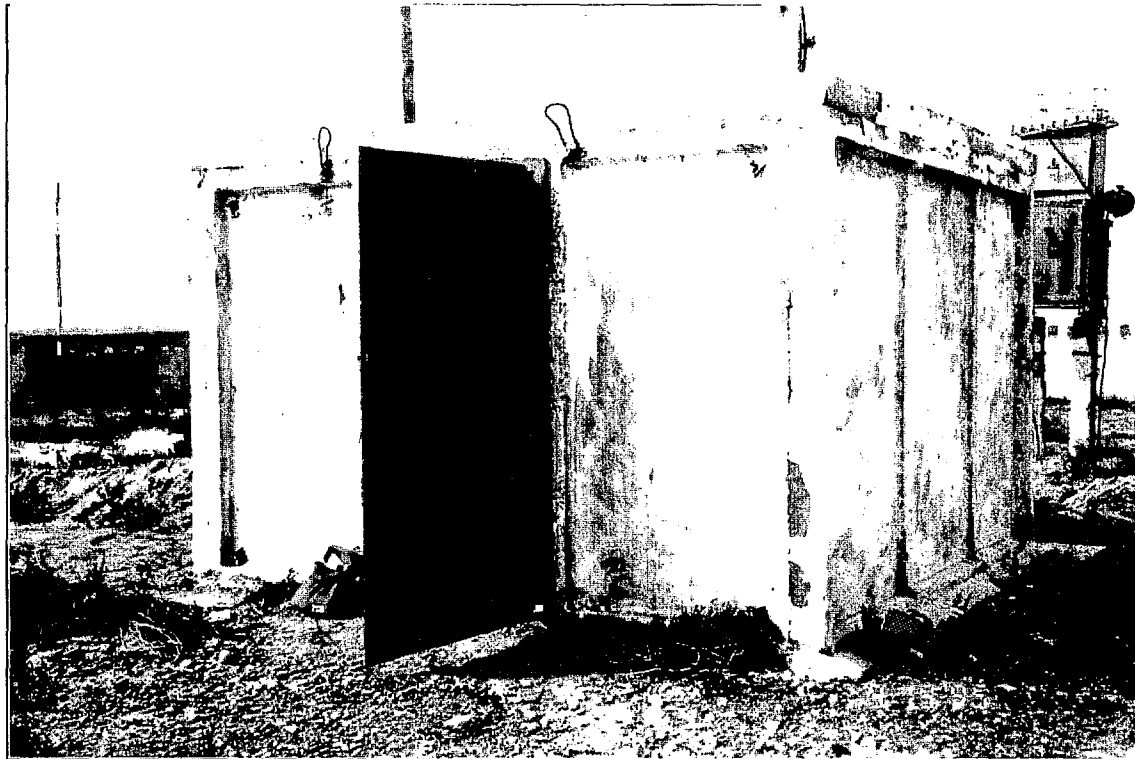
Pumphouse construction of pre-cast concrete, typical of Wells 1 to 12 and 23 to 30. Constructed from 1990 to 1992.
